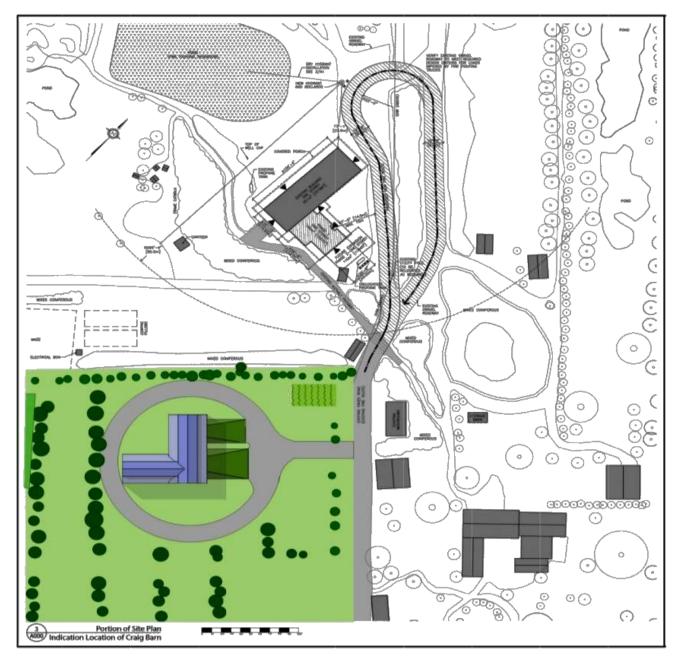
A site plan of a portion of the Saunders Farm showing the placement of existing buildings and their relationship to the proposed barn. The collection of small buildings next to the road is suggestive of the utility buildings that were ringed around the barn at the Hazeldean site. The circular drive around the reinterprets an original feature.
